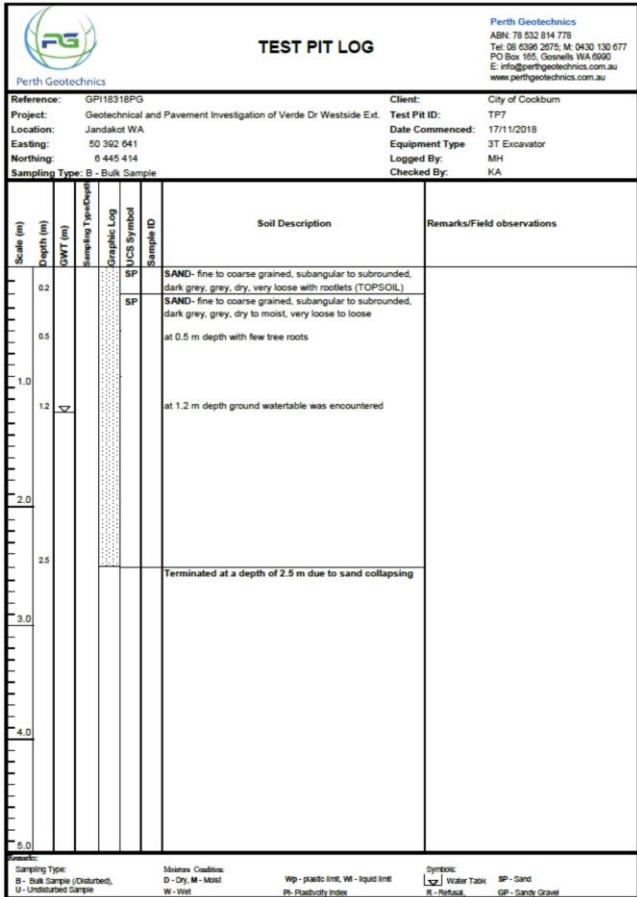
Test Pit Log (Verde Dr.) at Location TP7
